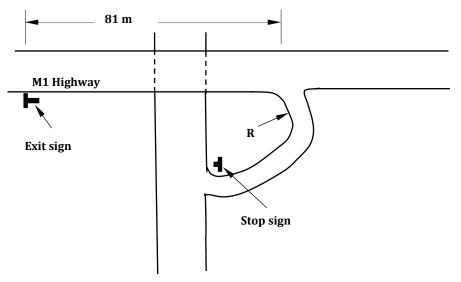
Layout of M1 Highway Ramp and a Local Street
